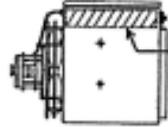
WALL MOUNT - HORIZONTAL AIR FLOW
